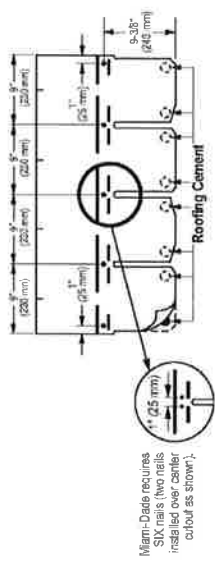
Use FIVE nails and eight spots of asphalt roofing cement under each tab corner.
